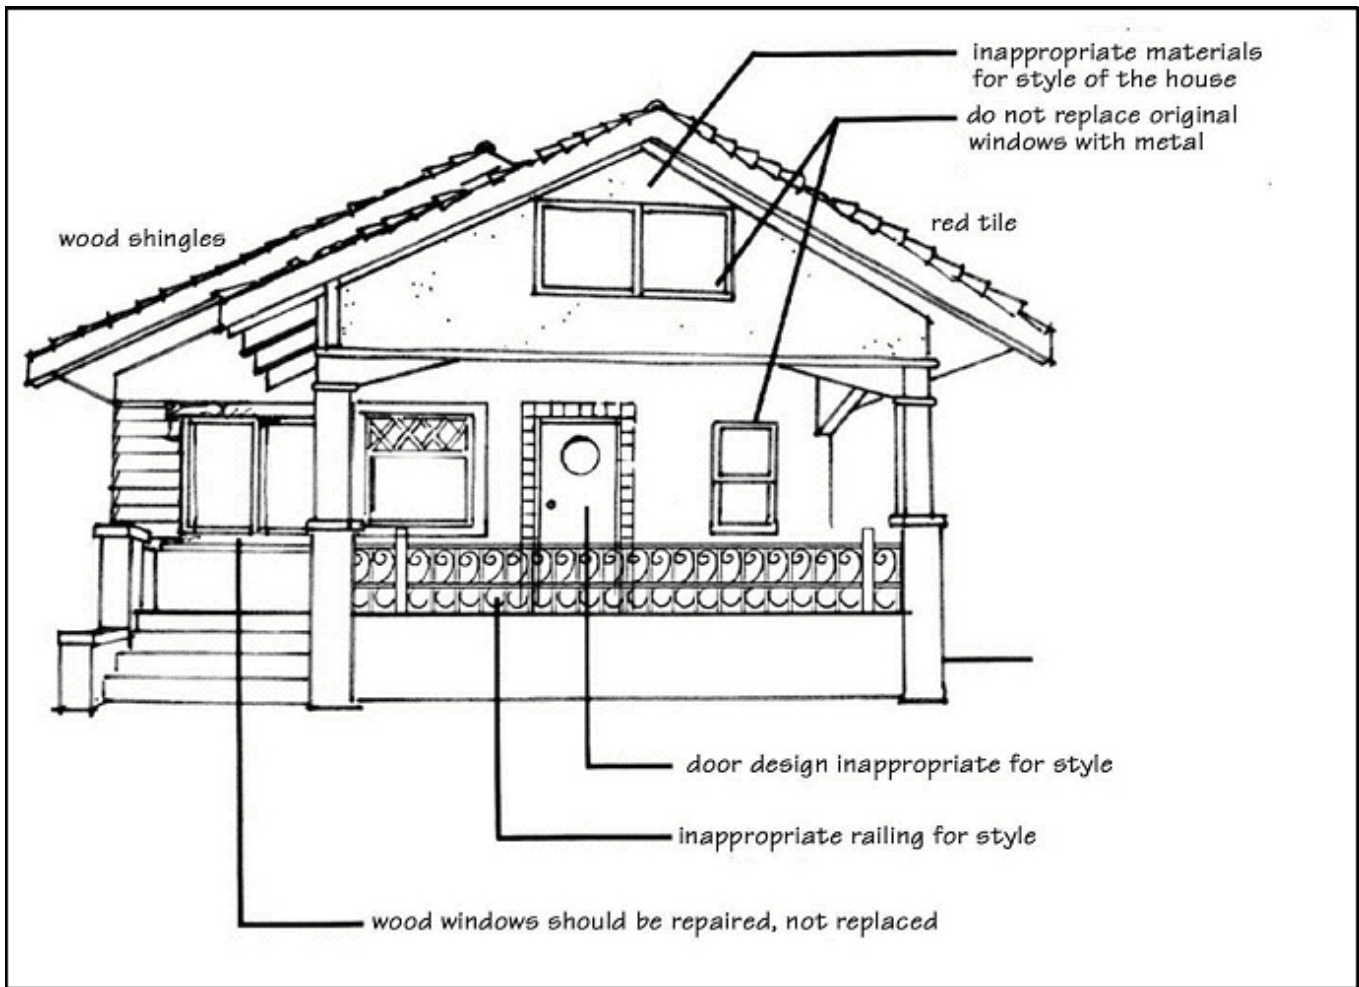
Avoid piecemeal additions and architectural features that do not complement the original style of the building
